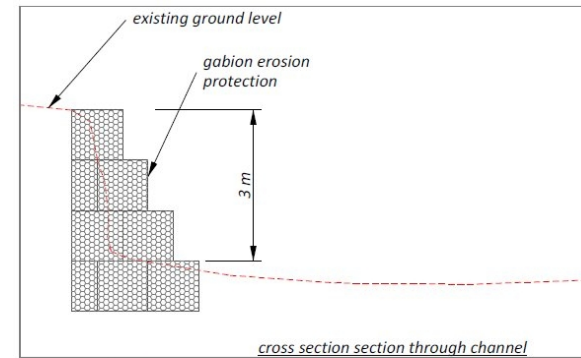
Protection of Embankment Downstream of Retaining Wall
